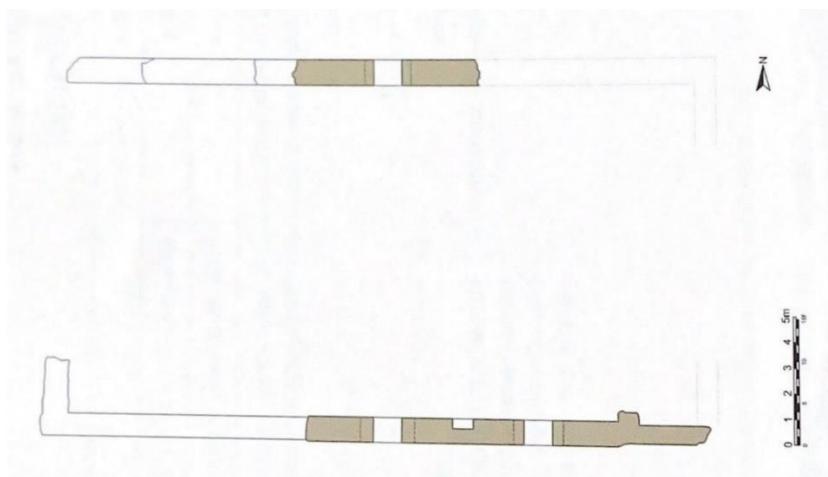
Plan Survey of Surp Hagop Church (Source: EACHAR, 2018)
